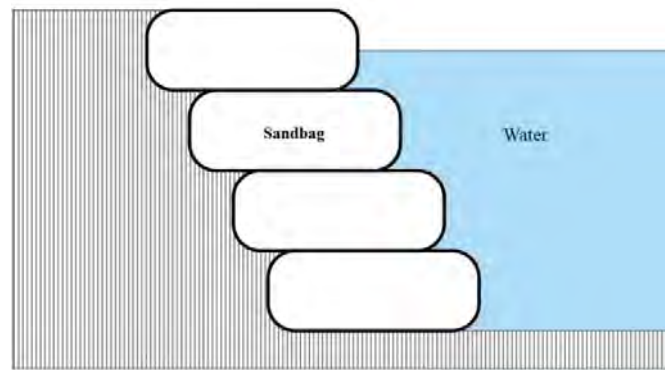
Retaining wall by filled sandbag (Kim & Inc, 2005)
